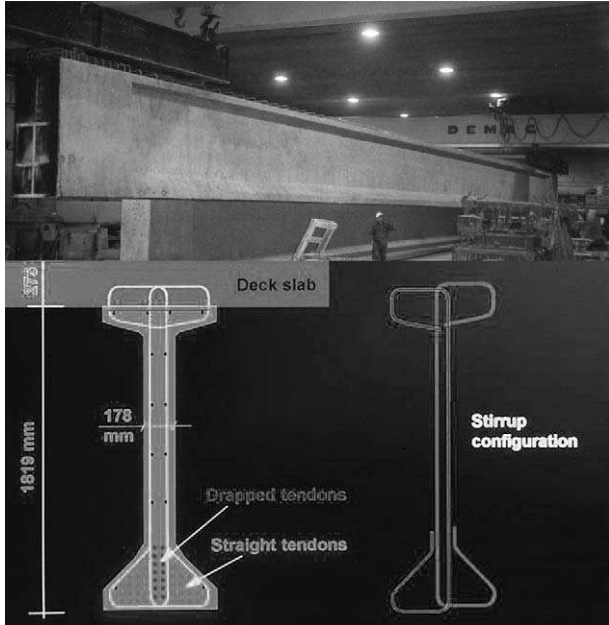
Photograph of one of the precast Taylor Bridge I-beam girders, and (below) a schematic of the girder and its reinforcement design. Used with permission, ISIS Canada.
